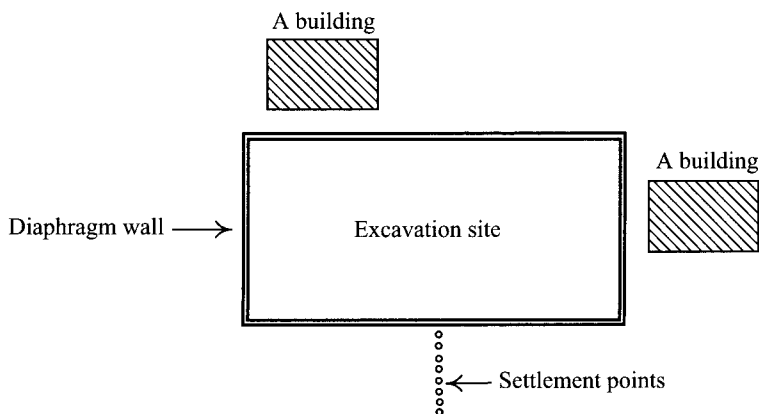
Buildings located at corners or along the shorter side of an excavation.
